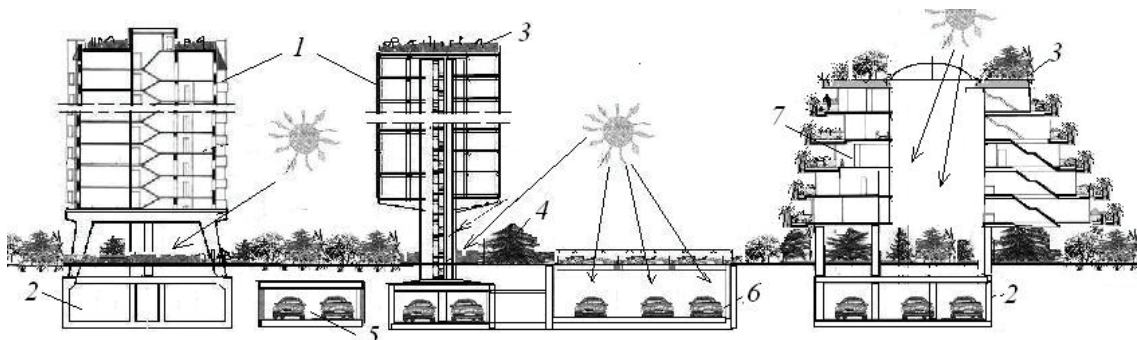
Scheme of “zero” ecocity with ecobuildings: 1 – overground buildings; 2 – underground parts of buildings; 3 – green roof; 4 – soil-vegetable layer; 5 – underground structures; 6 – underground street with sun lighting; 7 – “green hill”
